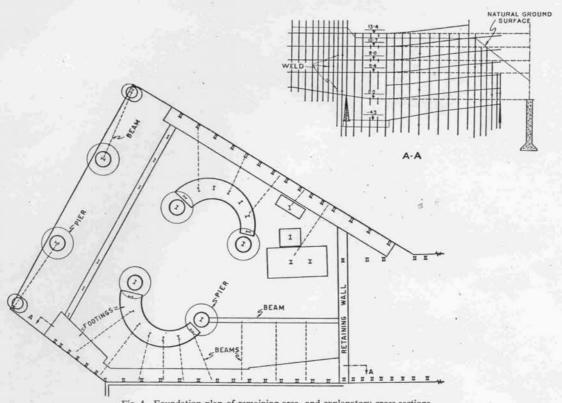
Foundation plan of remaining area, and explanatory cross-sections Projet des fondations de l'autre partie, et coupes explicatives
